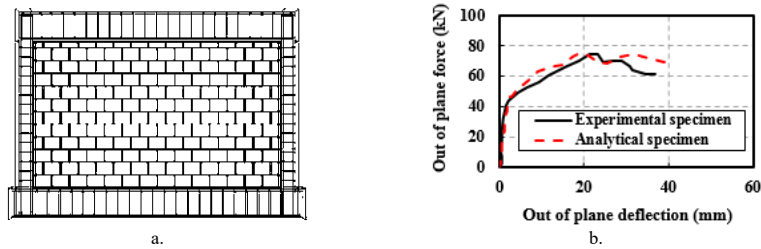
Verification of the non-seismic masonry infill-frame specimen under out-of-plane loading at 0.85% drift.
